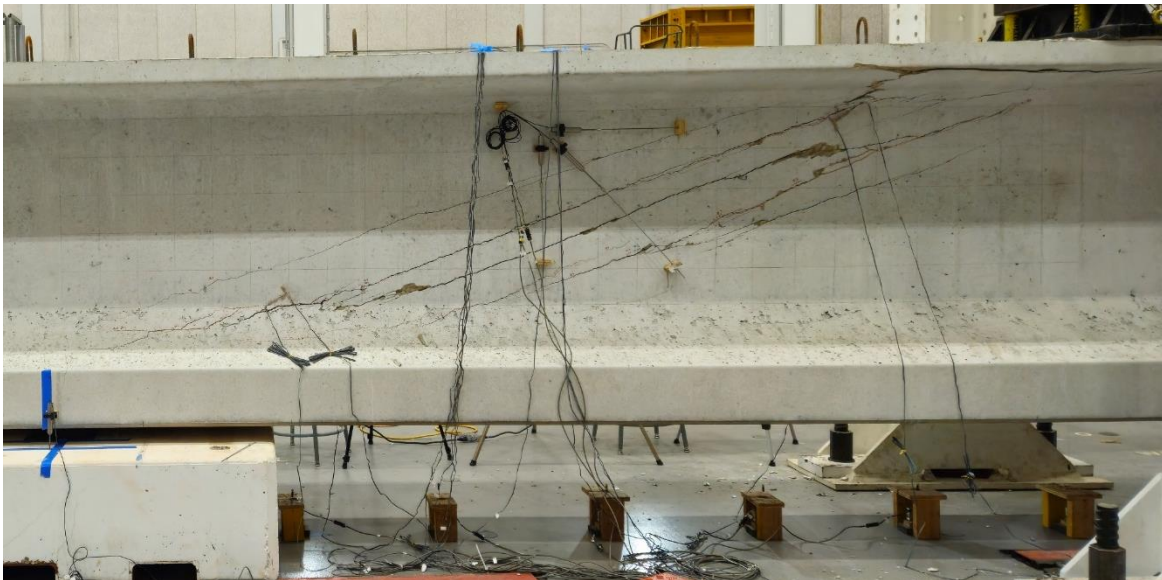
West side of G5 girder at cracking load.
